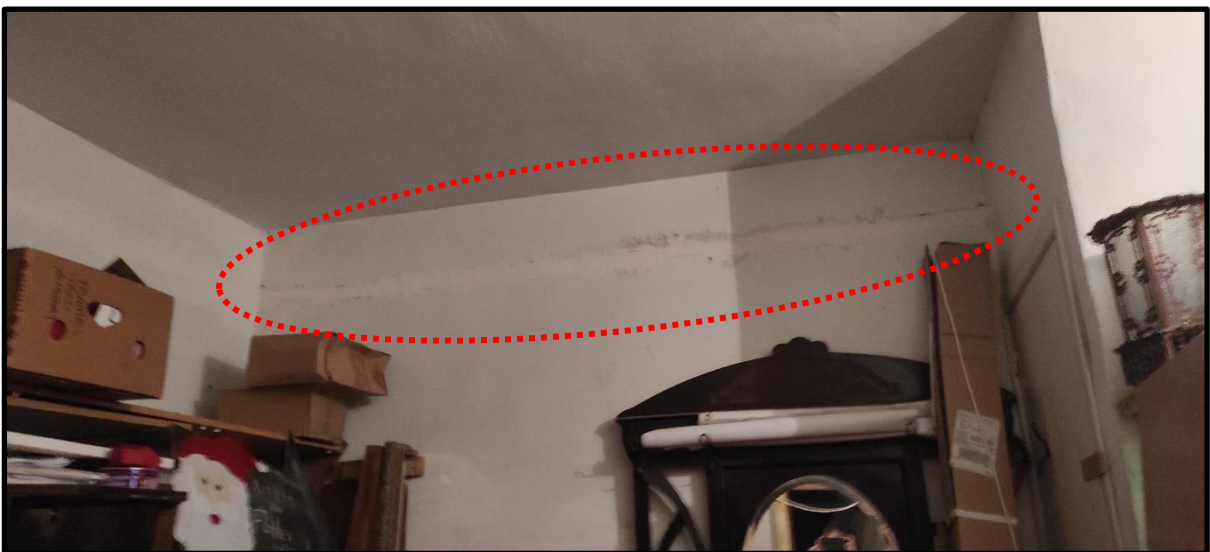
Theatre – Backstage store rooms – patched paintwork
